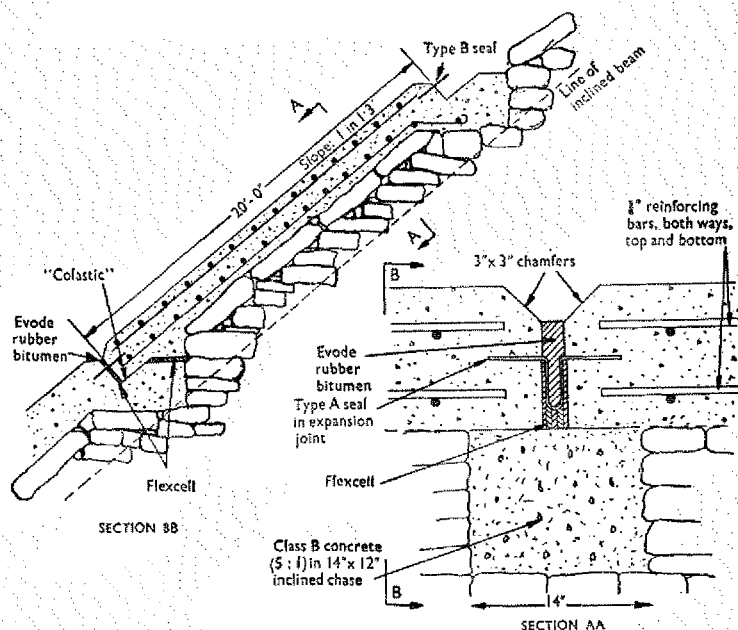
QUICH DAM. UP-STREAM SLAB AND BEAMS
